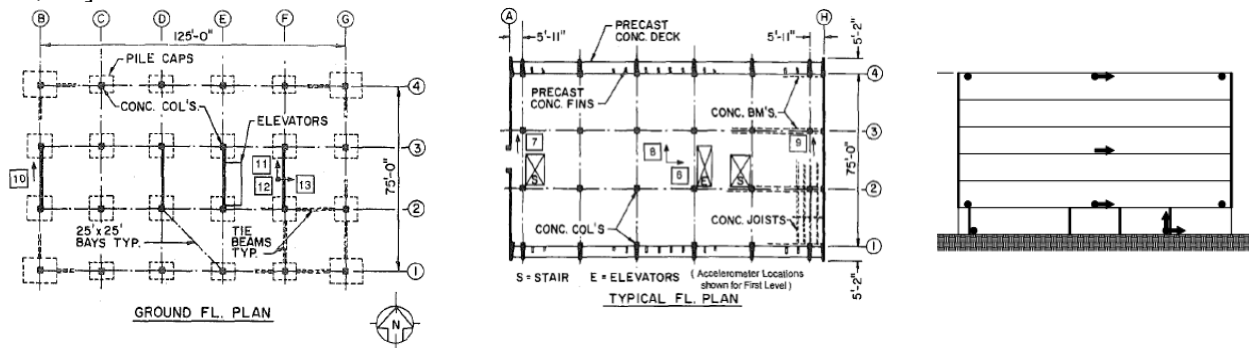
Floor plan and accelerometer locations, after Sozen et al. [8]
